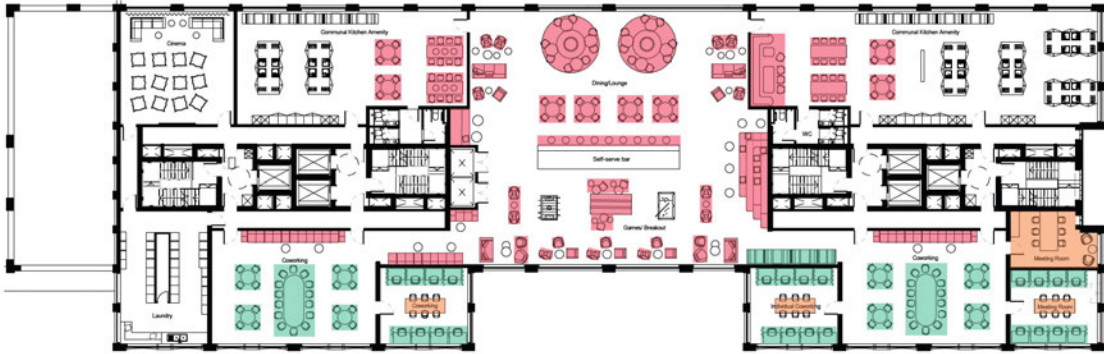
(above): Floorplan of Level 01 of the proposed PBCL, with co-working areas highlighted in green and AV-equipped workspaces highlighted in orange.
